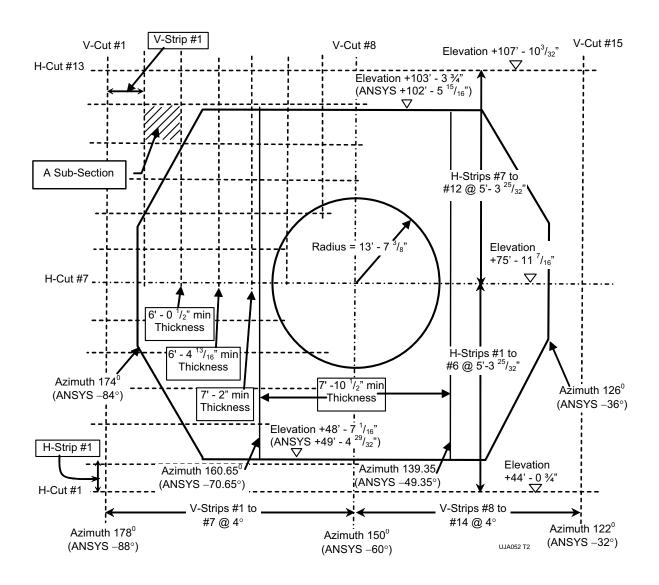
E.1-11—Sections 1-1 and 2-2 of the Equipment Hatch Area
